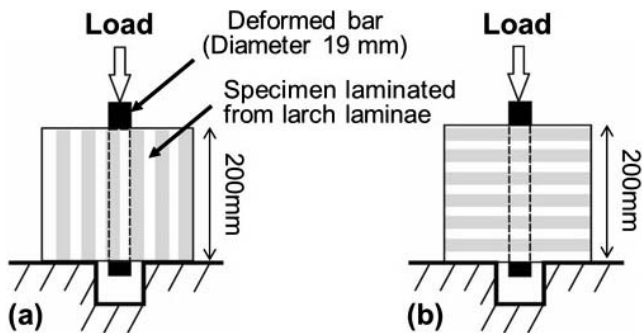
Pull-in test method for glued-in steel rods: (a) parallel to grain and (b) perpendicular to grain.
